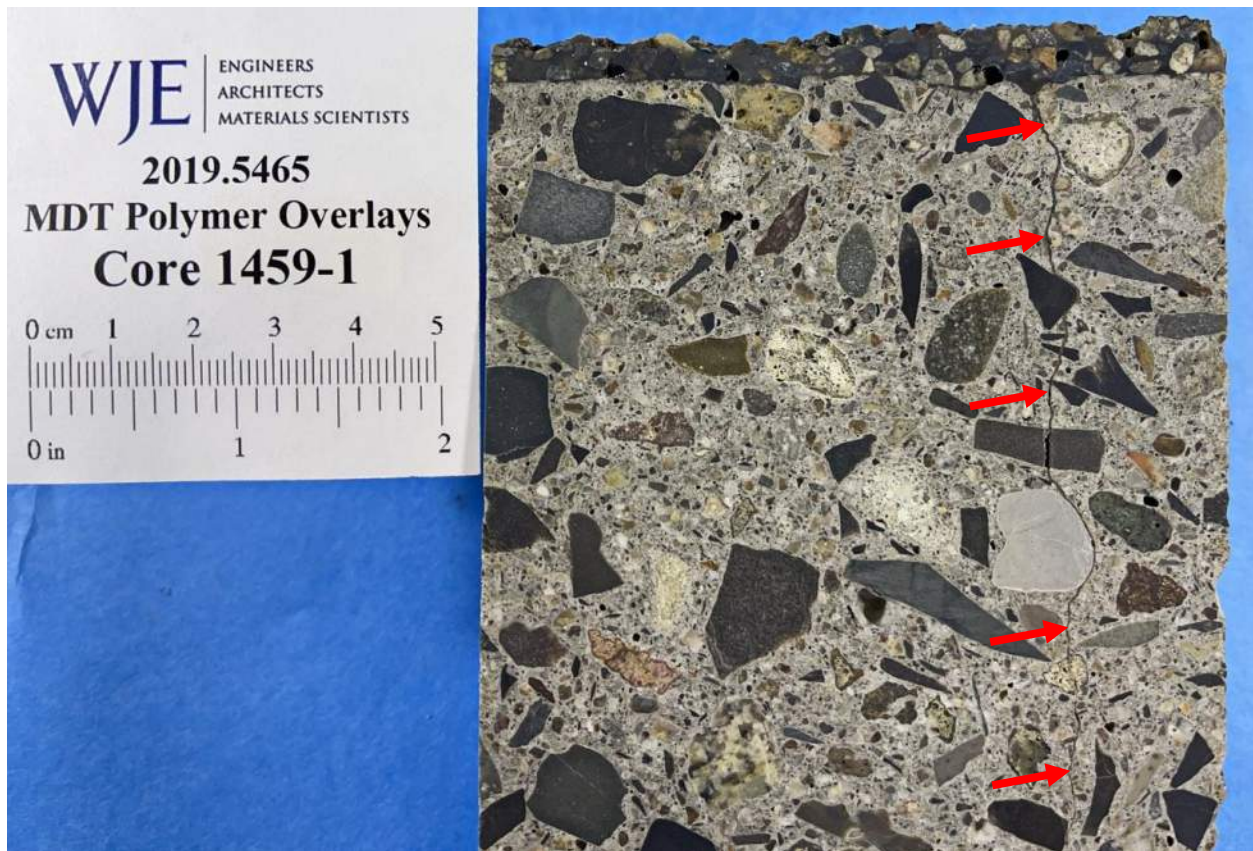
Core 1459-1. Lapped cross section shows the overall appearance of the PPC overlay and top ~4 inches of the substrate concrete. Arrows indicate a vertical crack, further shown in the figure below.
